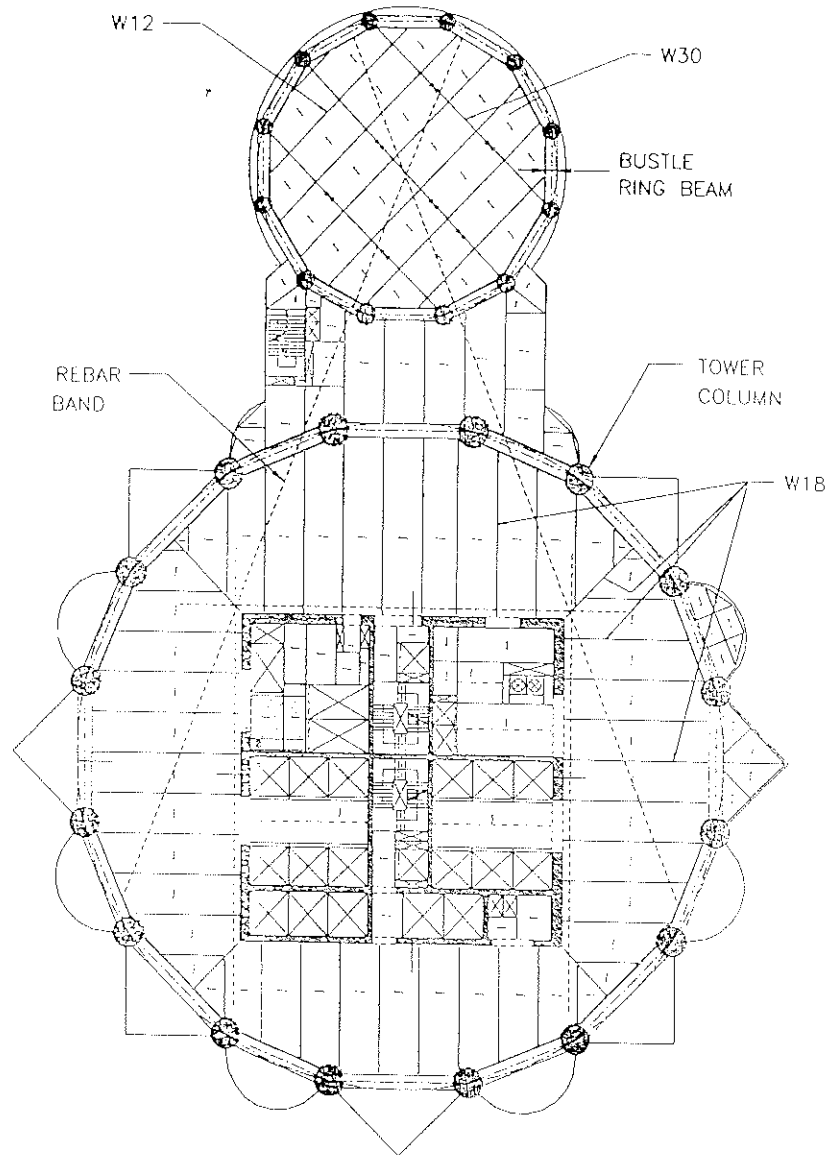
PLAN VIEW OF THE PETRONAS TWIN TOWER BUILDINGS
